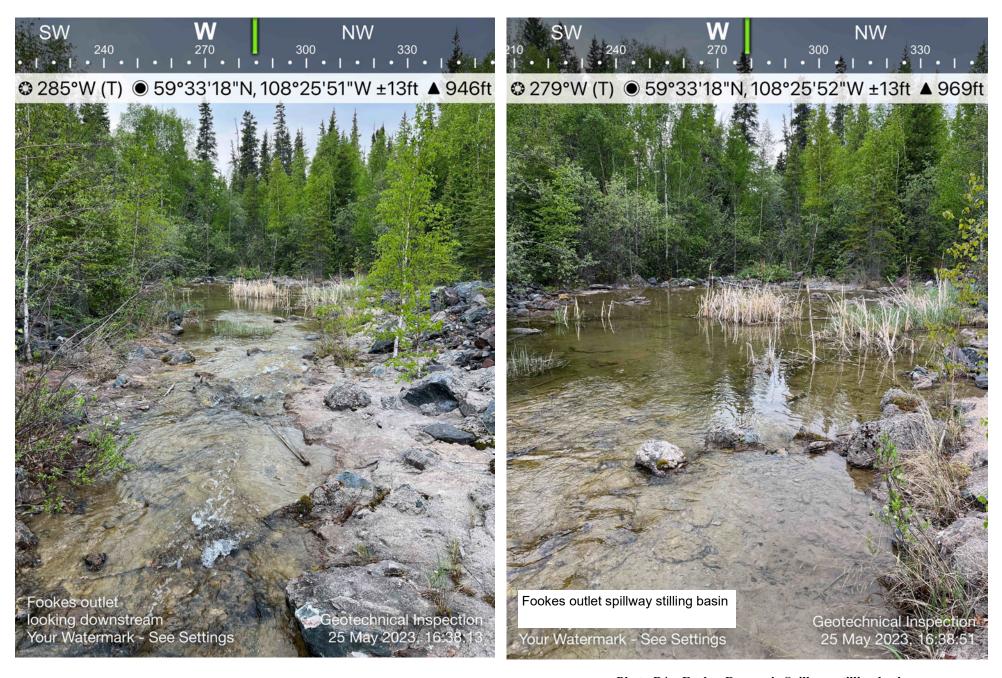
Fookes Reservoir Spillway looking downstream (mid channel)
